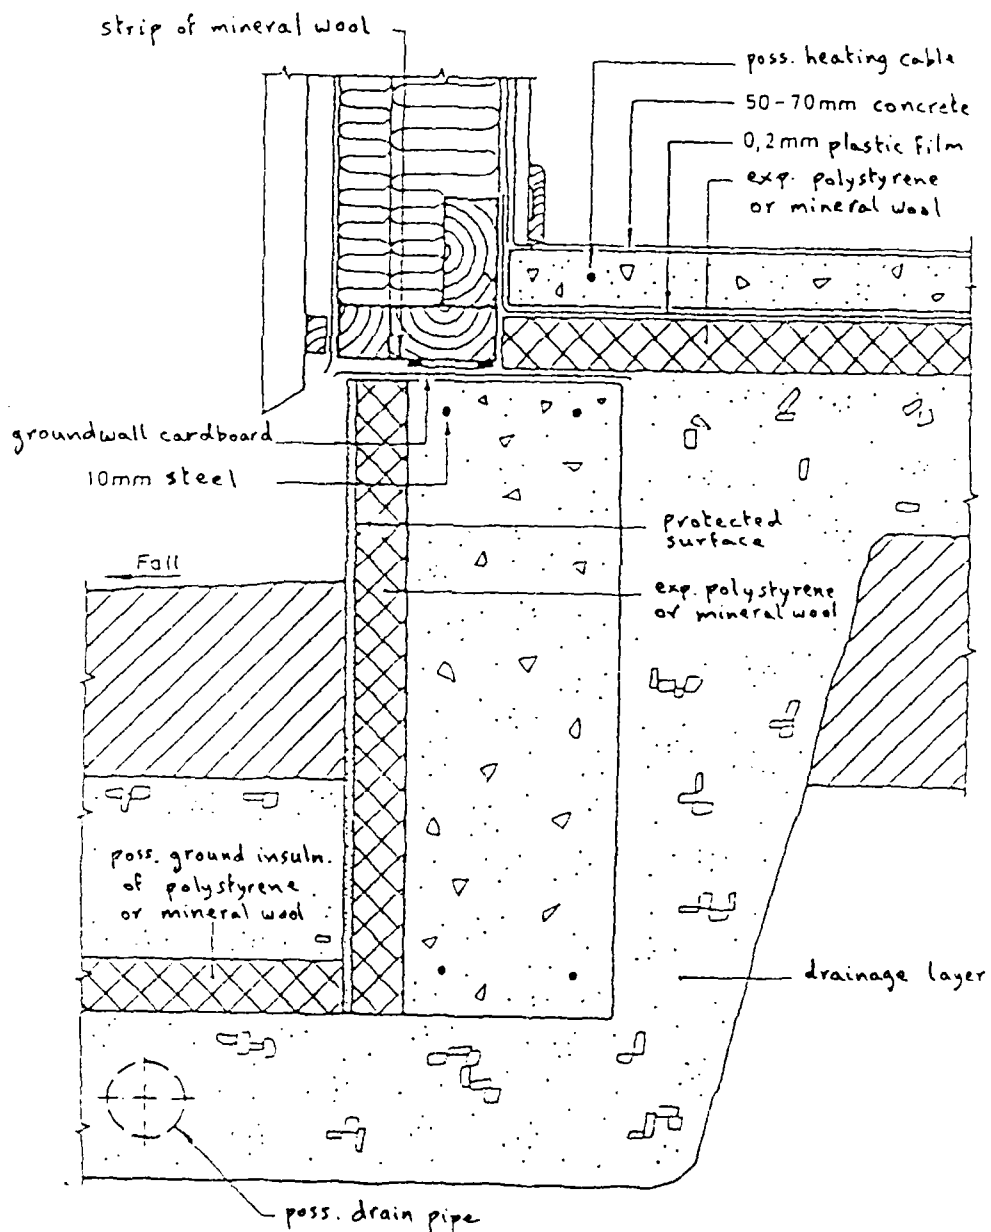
Concrete slab with externally insulated concrete foundation wall.
